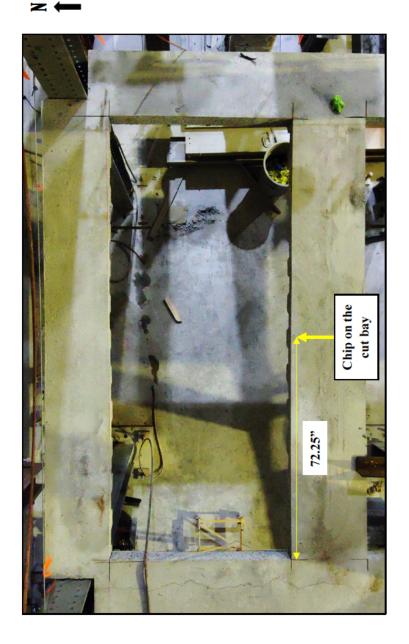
(a) Aerial view showing the cut bay for Slab 4. Arrow points to a "chip" in the surrounding floor of south cut face.
